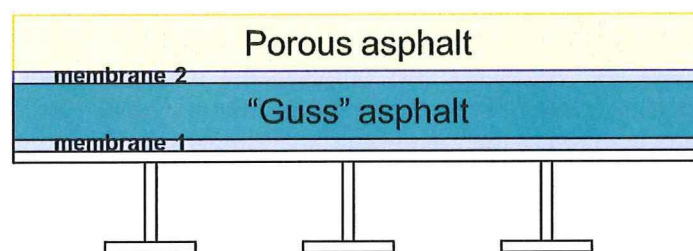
Schematic of a typical Dutch asphalt surfacing system on a steel bridge desk
